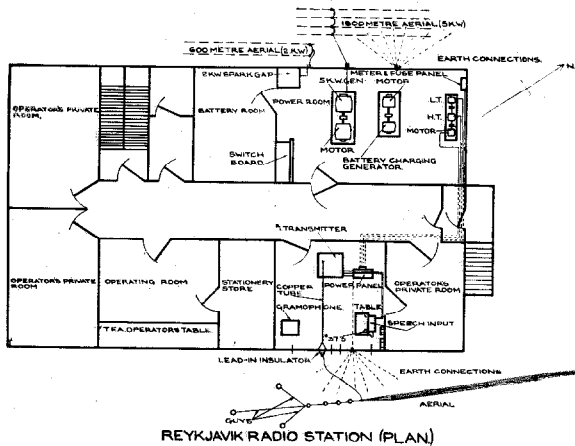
Reykjavik Radio Station—Plan of Main Floor
